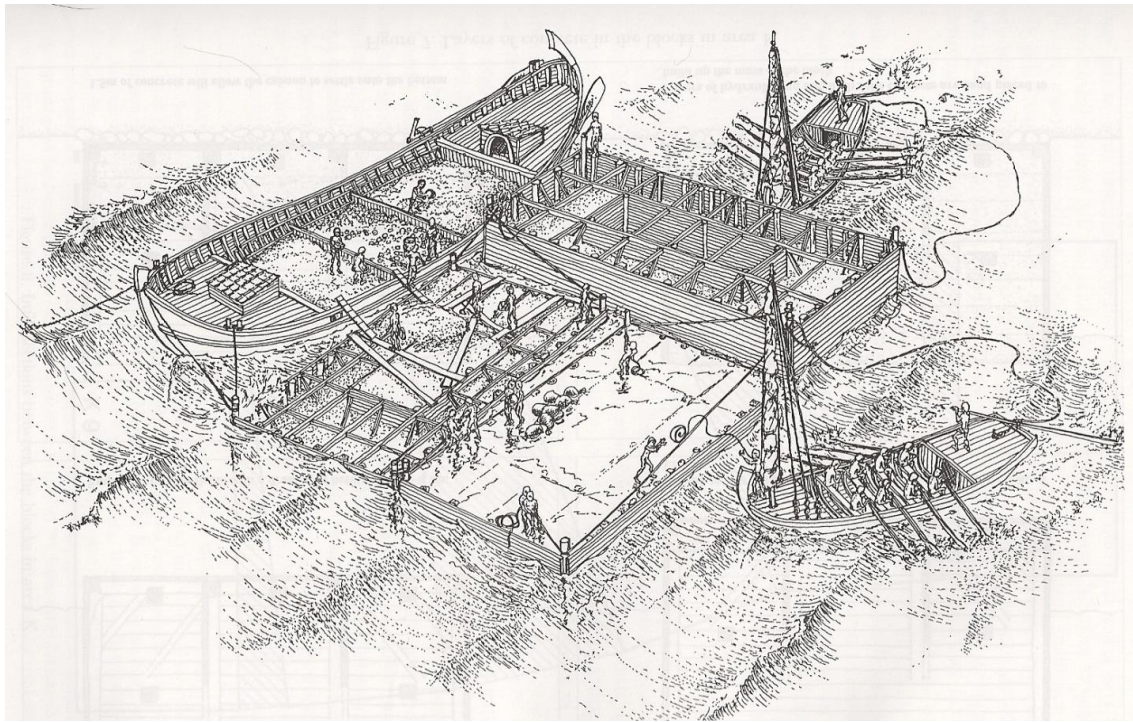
Examples of the construction techniques used to create the concrete moles at Portus.
